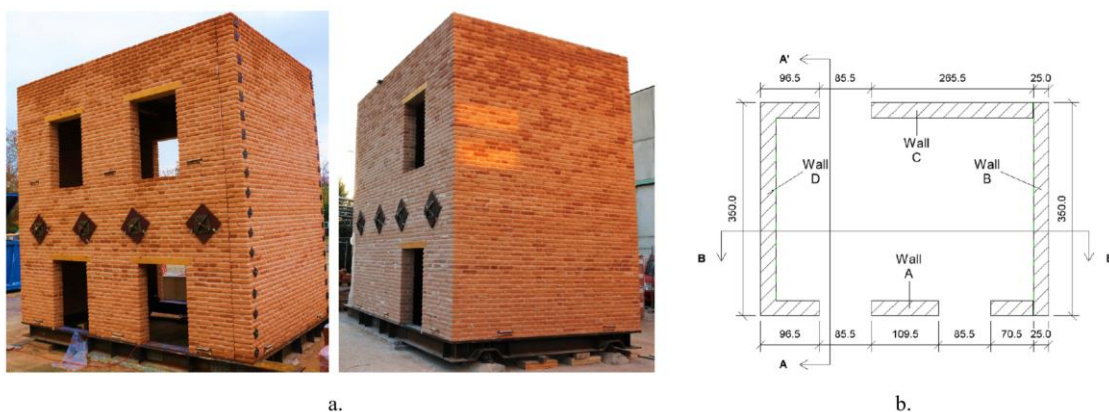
a) The real constructed a full-scale URM structure; b) footprint of the model
